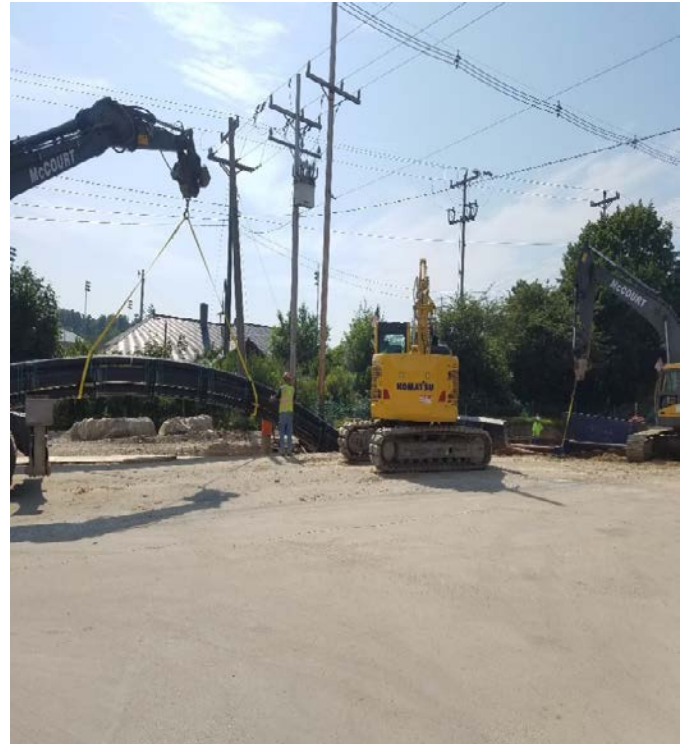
McCourt installing pipe through HOBAS pipe under Main St. Viewing east. (7-31-19).
